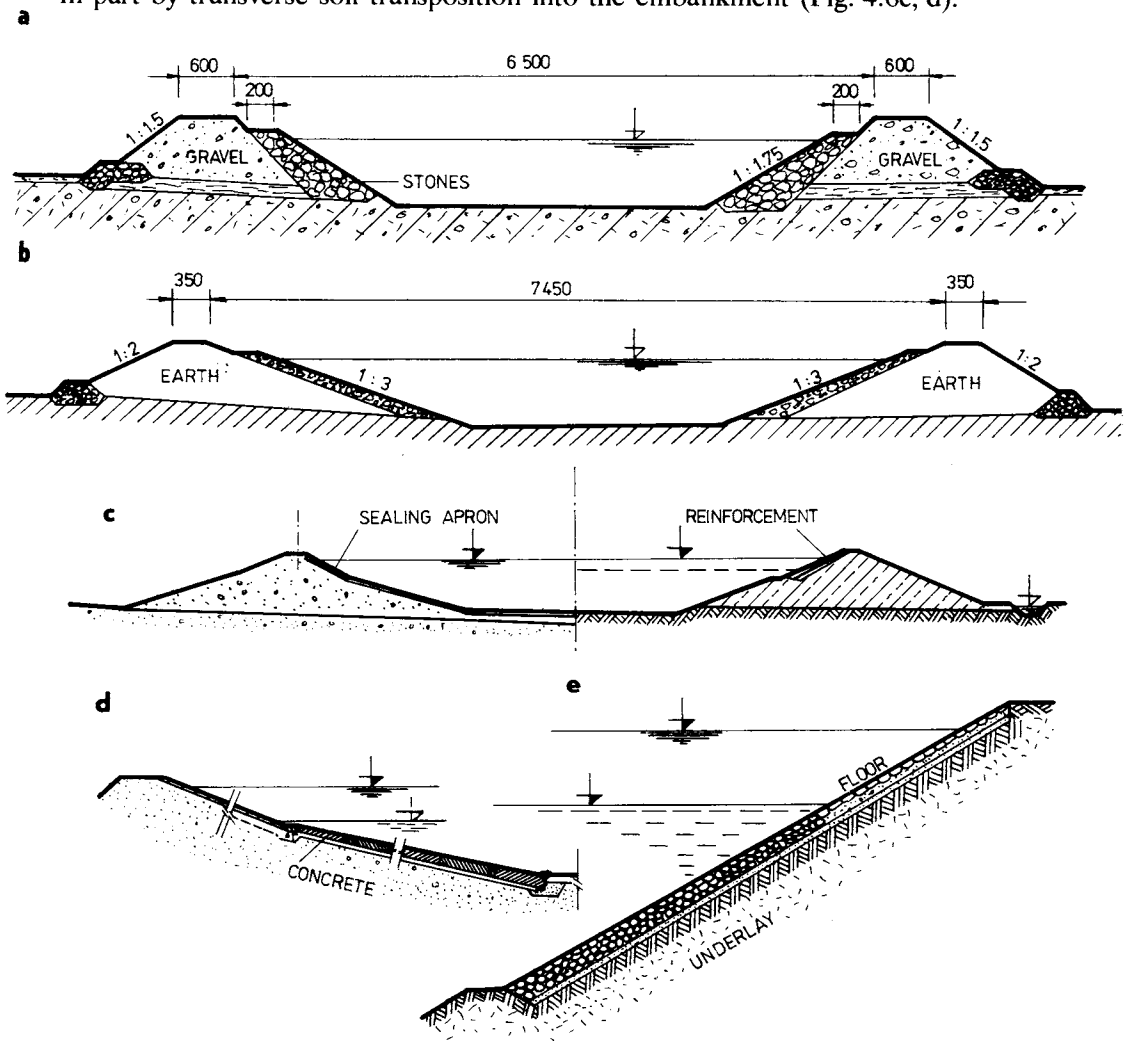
Embankment of a big canal and its slope protection. a — sandy-gravel dam and stone protection, b — earth dam, c — total arrangement of sealing and protection, d — concrete plates, e — rip-rap.
